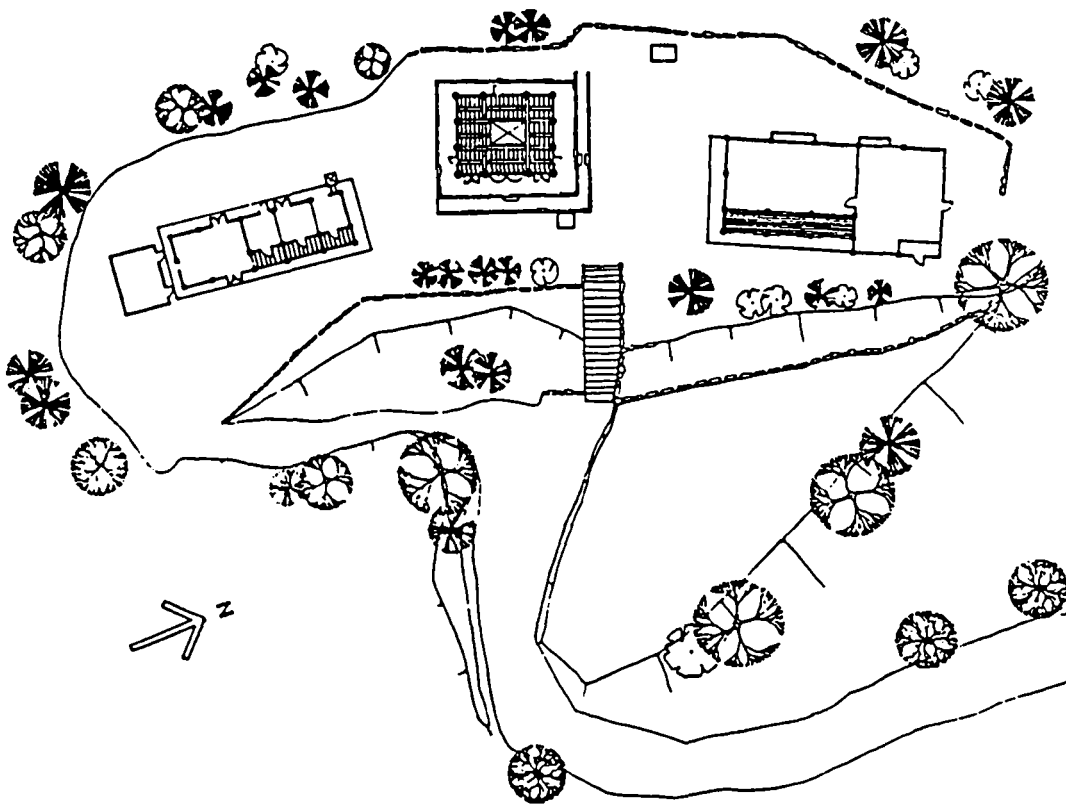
Ko-san-sa 高山寺 고산사; ground plan (scale: 1 : 500)
